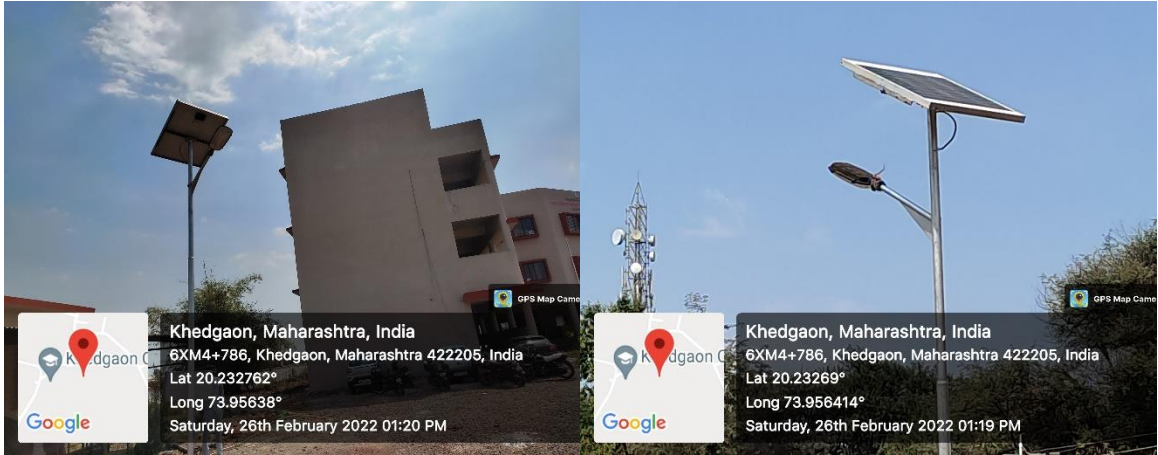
Photos shown Solar Street Light Installed in College, Campus
